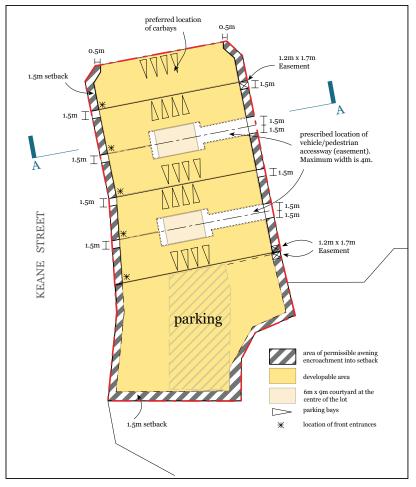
SITE H SITE SPECIFIC PLAN
